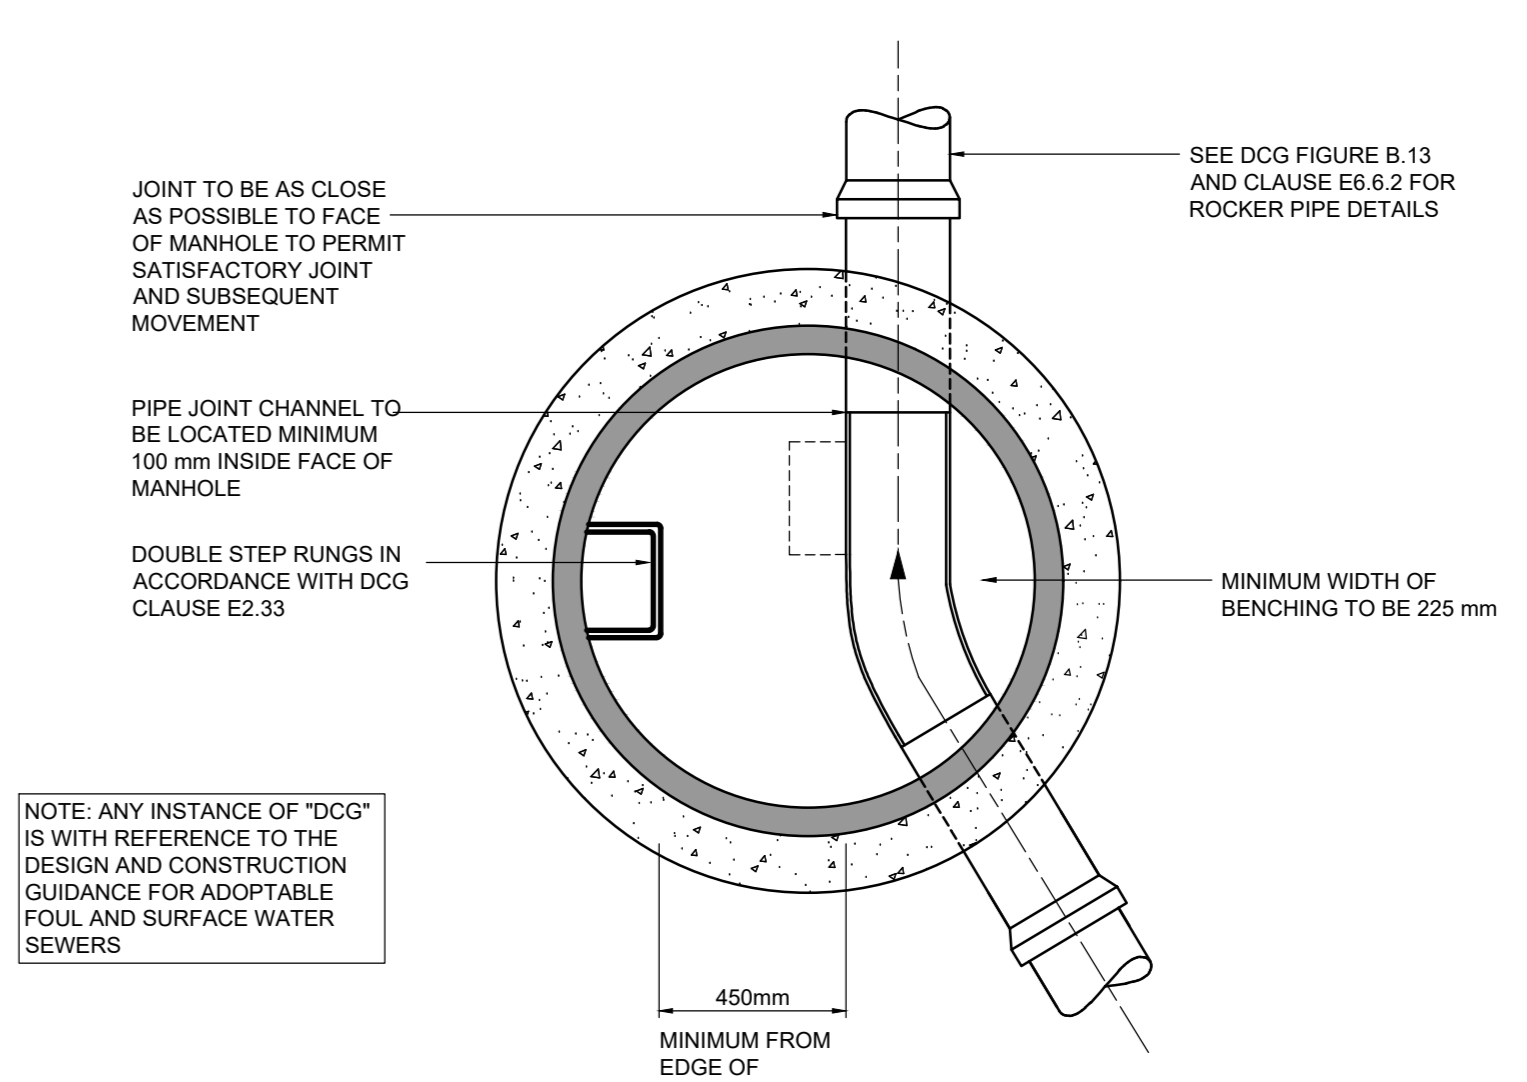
FLOW CONTROL MANHOLE TYPICAL DETAIL
